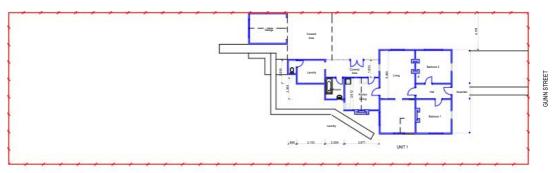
Site Plan. Source: The writer/ carste STUDIO
